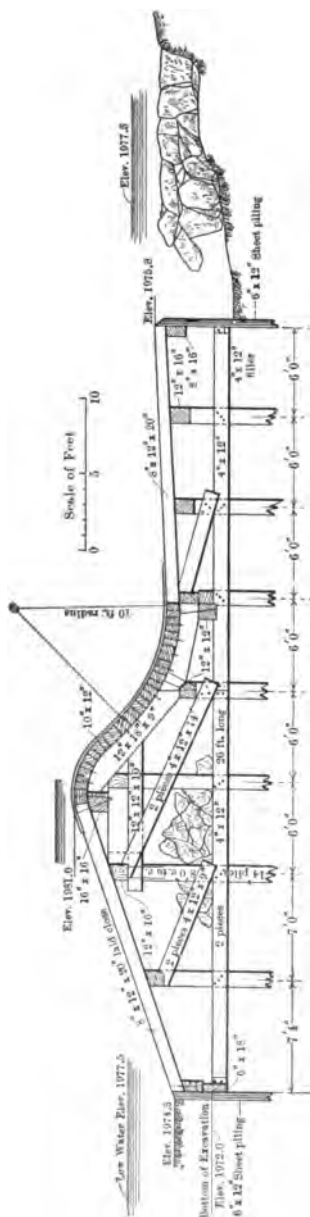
Cross-section of Lower Yellowstone Weir, Mont.
